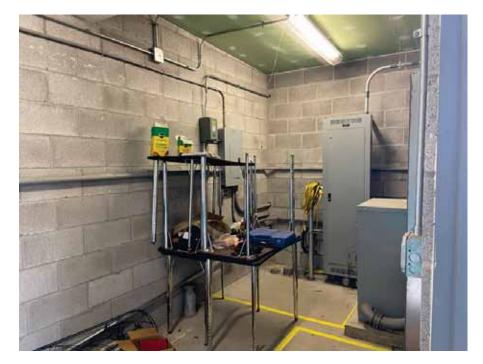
Pad-mounted transformer in storage building underneath bleachers in Area Two
